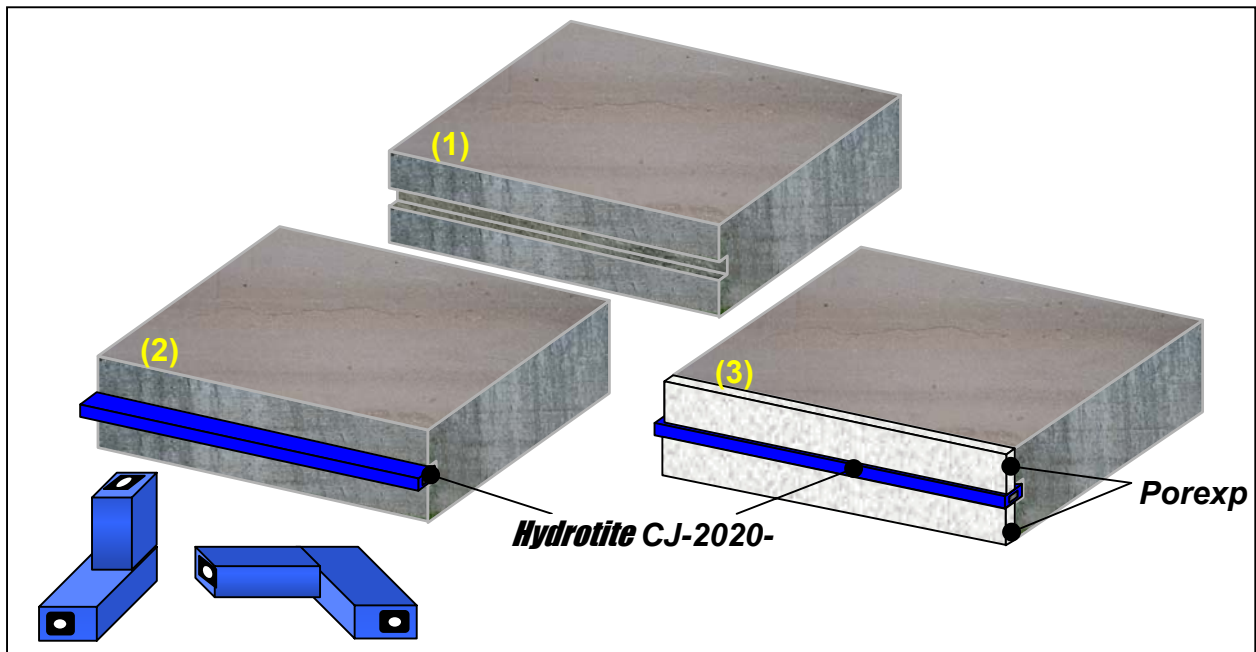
Placing of water-swelling profile for expansion joints during concrete pouring
